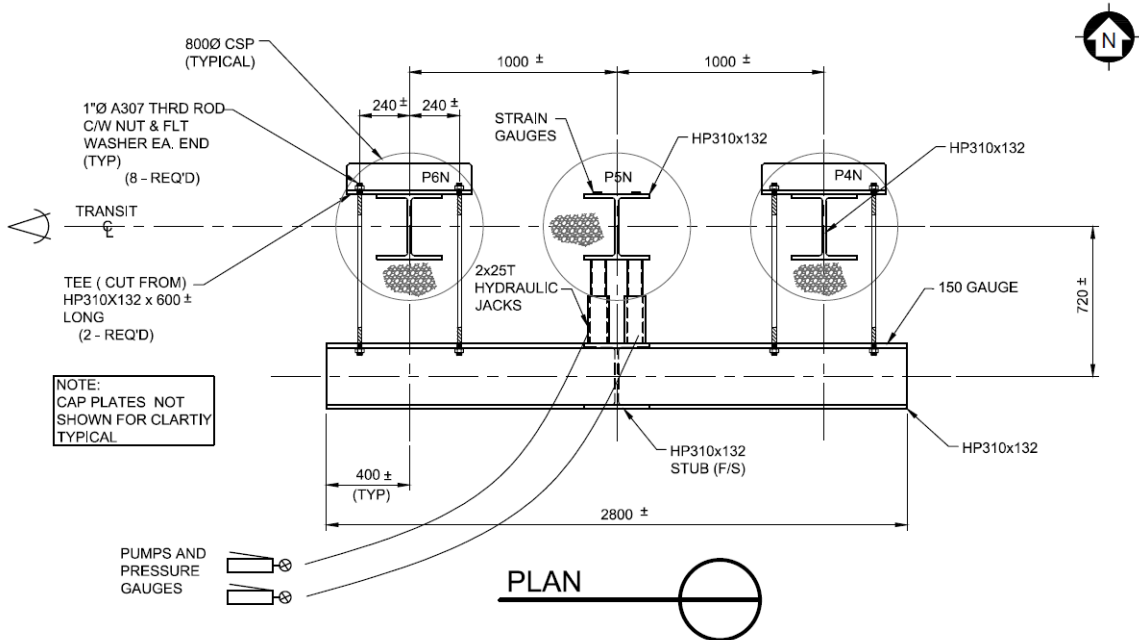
Plan View of Test Configuration for Static Push Test of Pile P5N.
